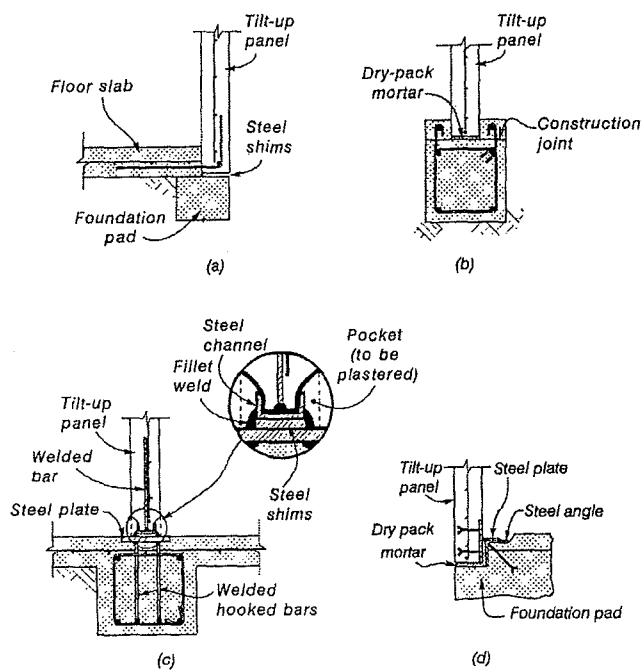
Wall-foundation connection designed as pinned connection [C1]
